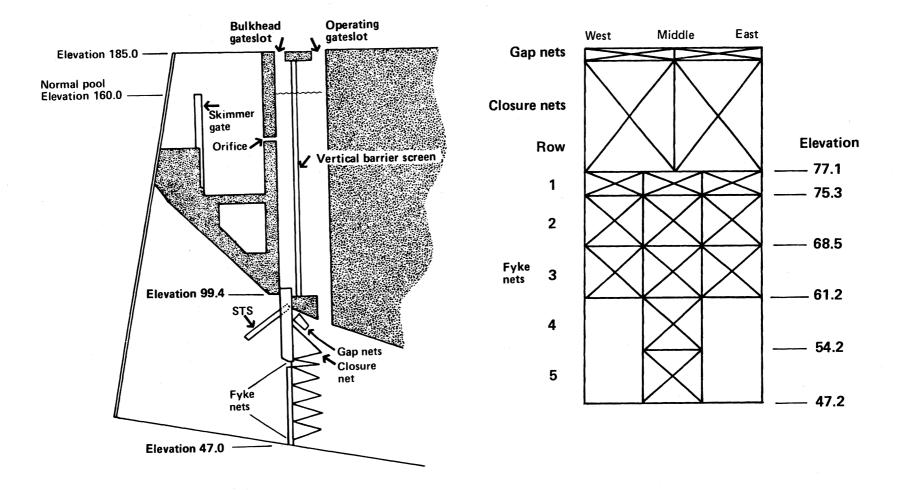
Transverse section through a typical turbine intake at The Dalles Dam showing the STS and the layout and elevations of the fyke nets used for FGE testing.
